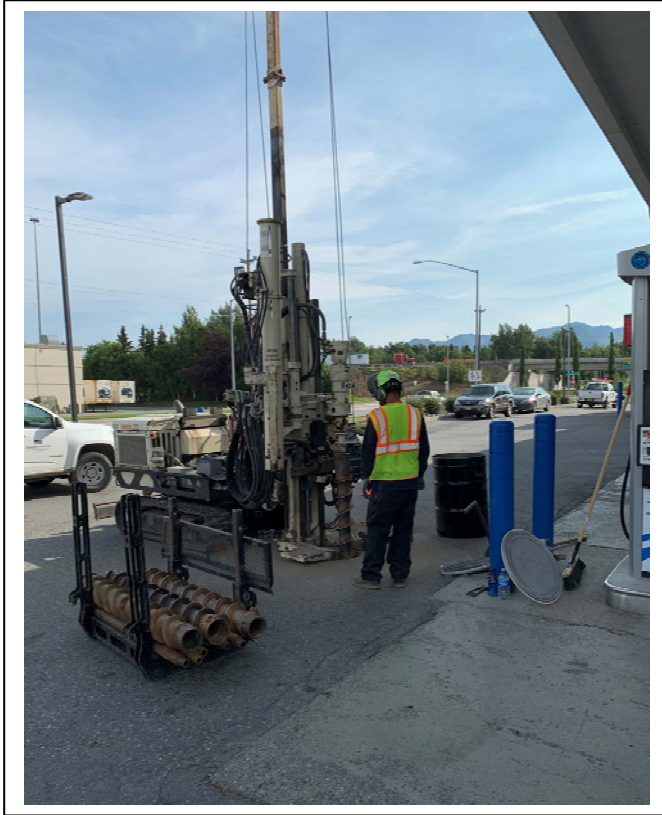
Looking northeast at the advancement of Boring B1. (July 30, 2020)
